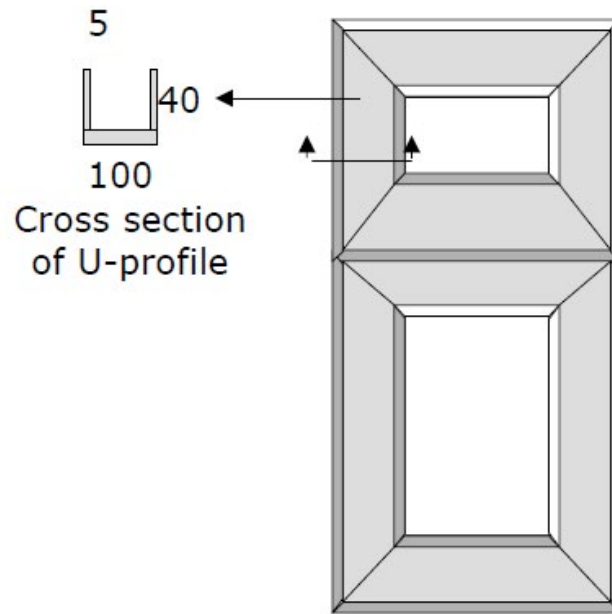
the top frame with U shaped to be filled with white construction sand.
